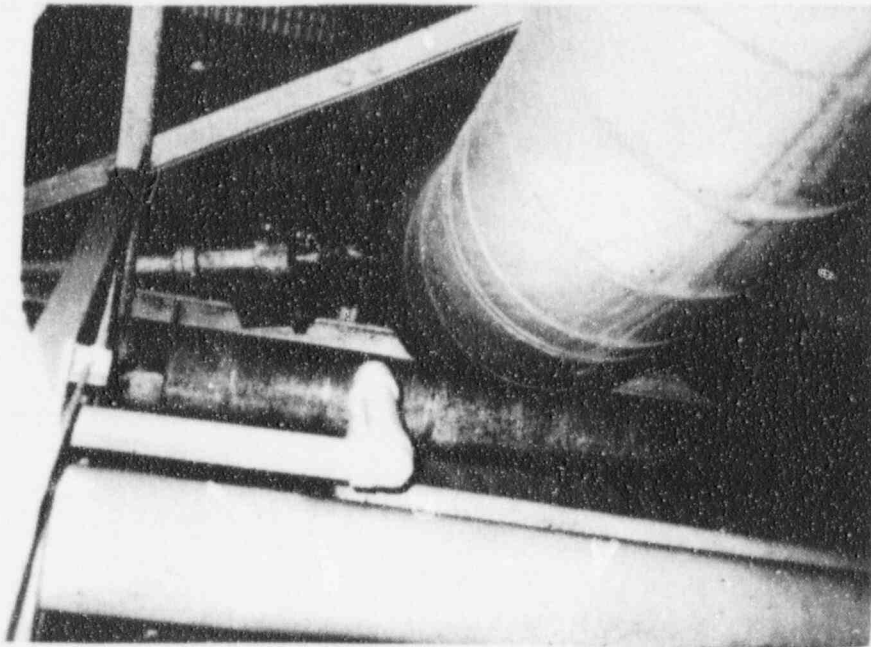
Glenarm Spalling Damage Due to Earthquake
